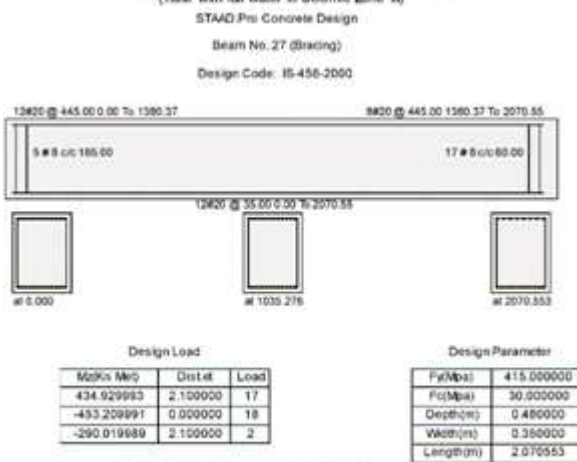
Reinforcement details of beam No: 27 (Tank with full water condition in Seismic Zone III)
